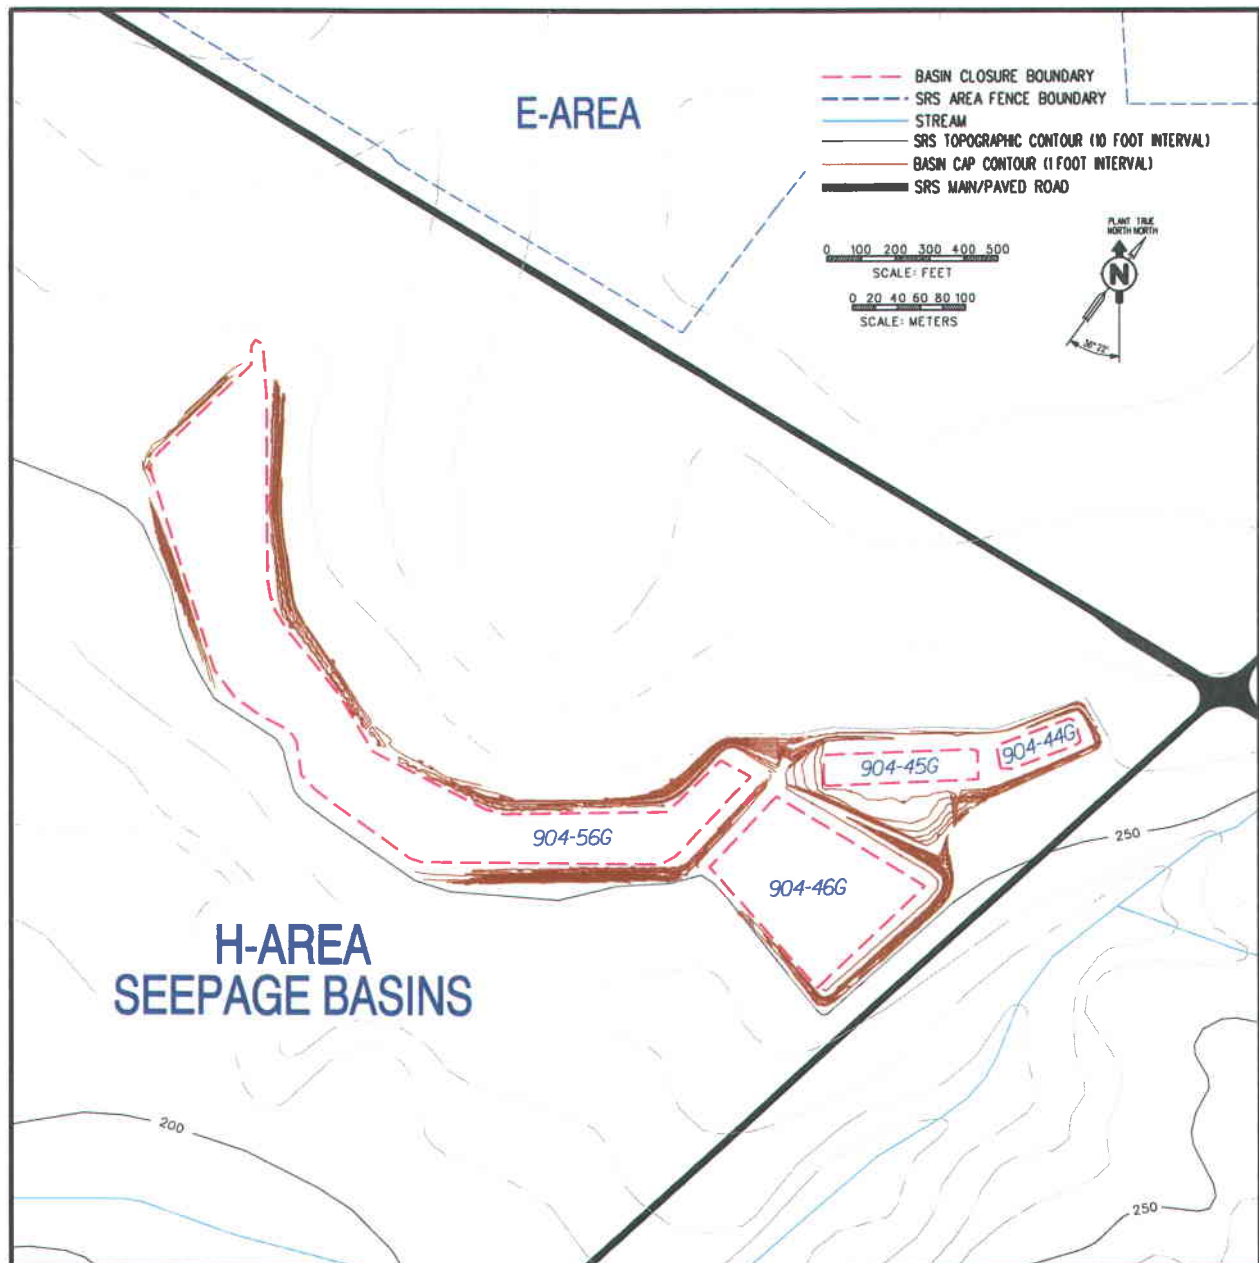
Site Layout for H-Area Hazardous Waste Management Facility
